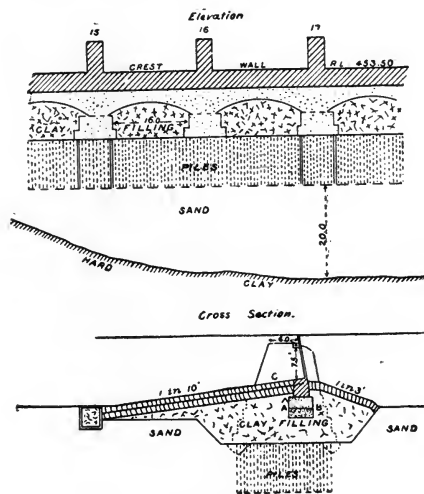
ELEVATION AND CROSS-SECTION OF SIDHNAÏ WEIR, INDIA.
